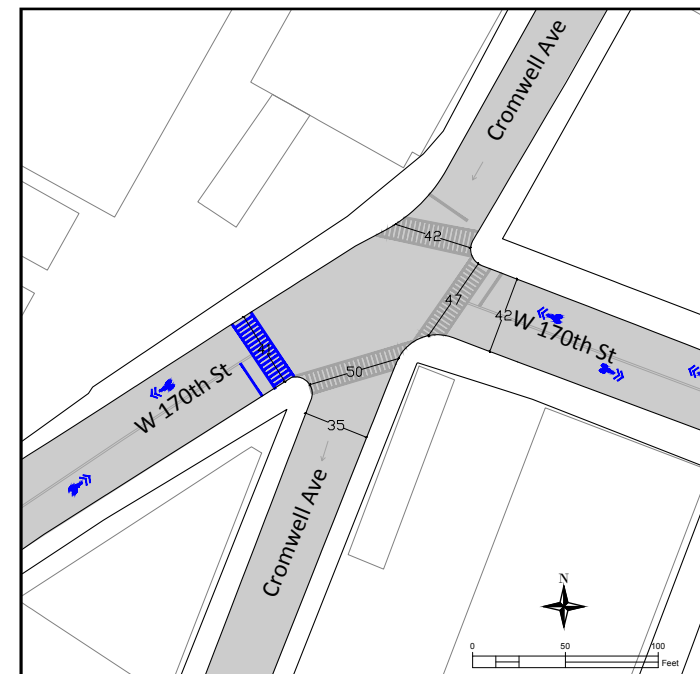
West 170th Street and Cromwell Avenue recommendation
